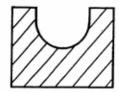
Water Spouts of Towers C and F in Vertical and Horizontal Section.
